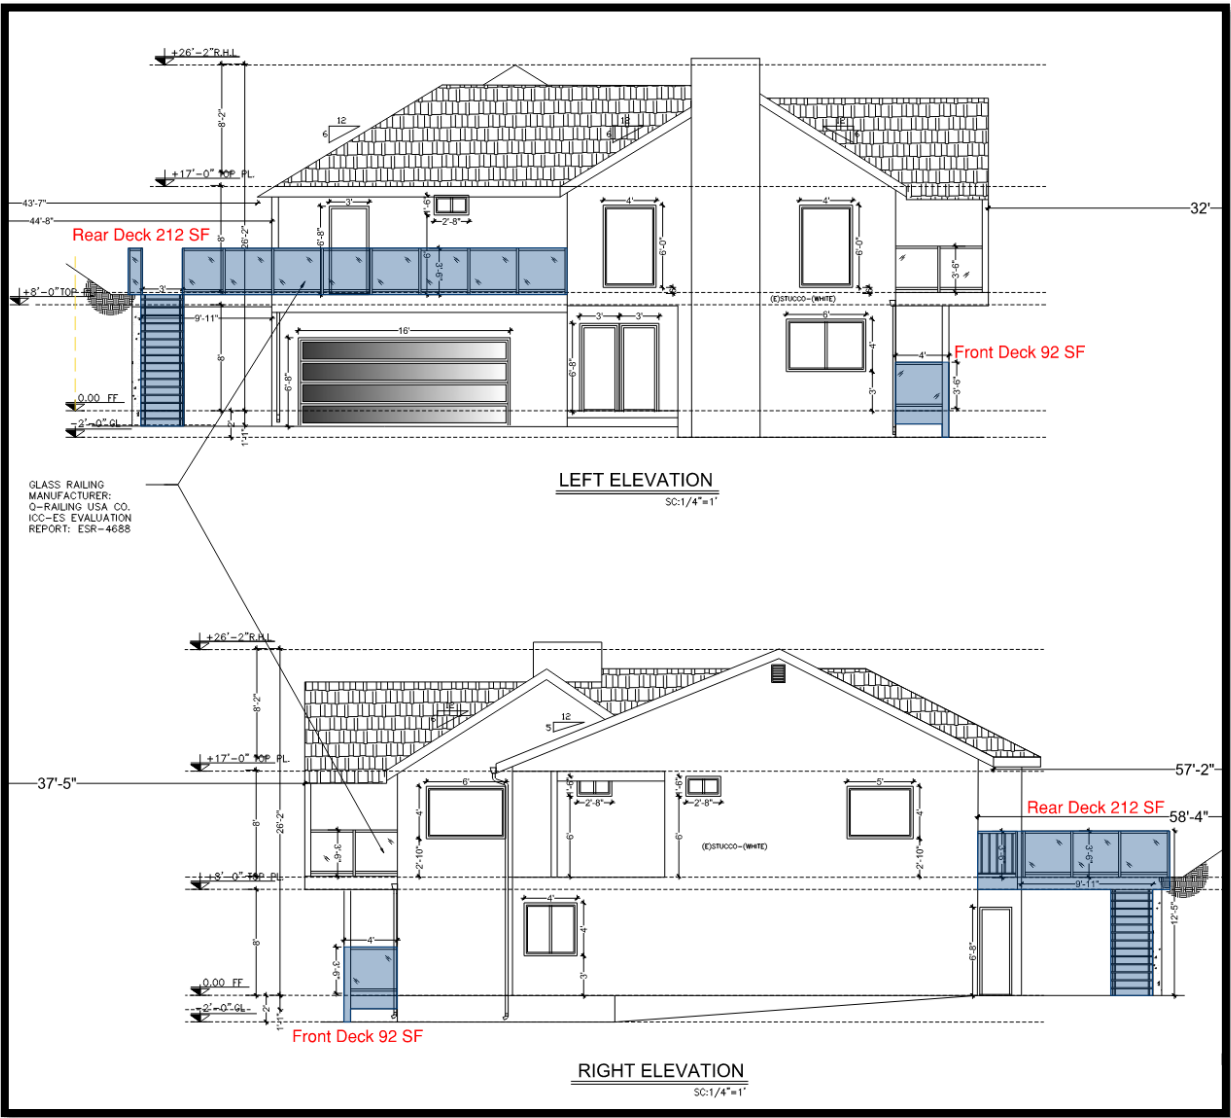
Elevation plan of the proposed development with additions shown in blue.
